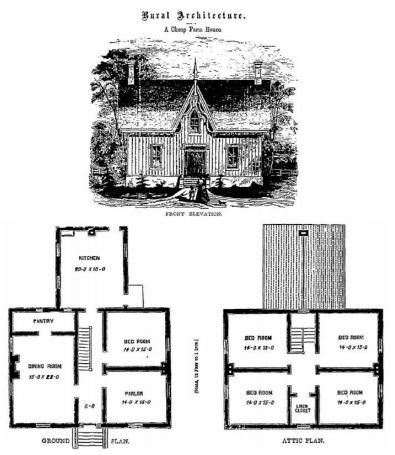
Elevation and floor plans for a 'Cheap Farm House' as promoted in the 1864 edition of Canada Farmer (1864:340-341)
